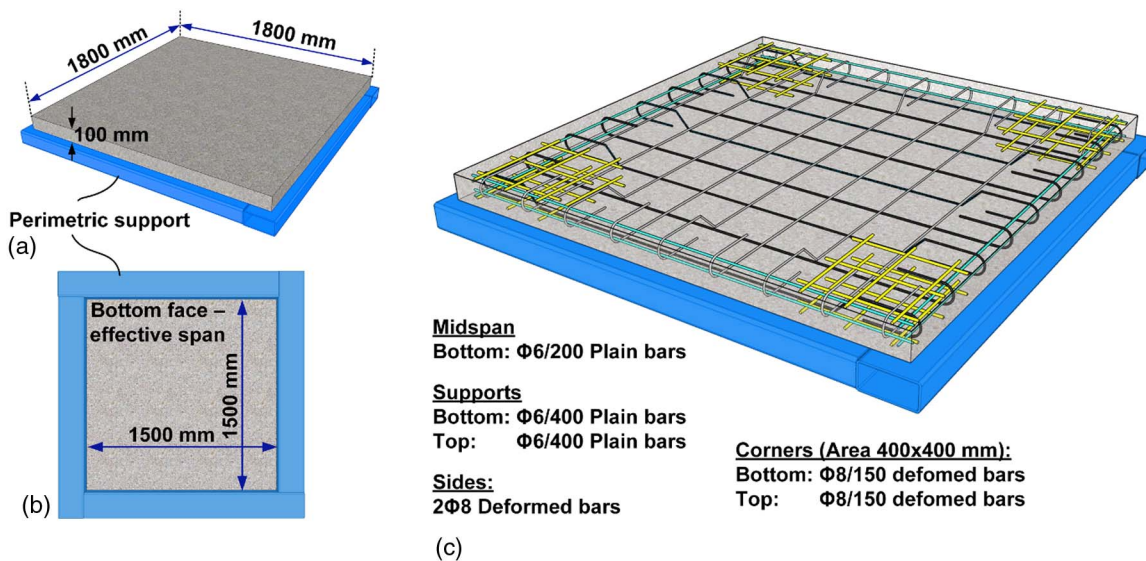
(a) Geometry of the slab; (b) bottom face of the slab supported in its perimeter; (c) steel reinforcement details and 3D visualization
